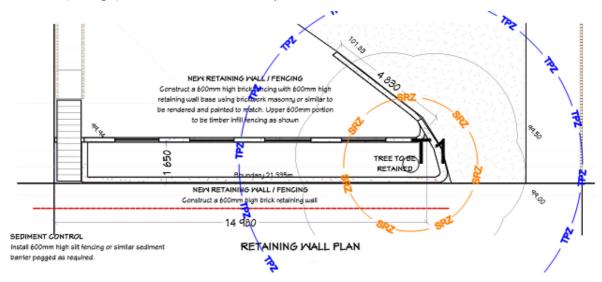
RETAINING WALL PLAN WITH TPZ AND SRZ OVERLAYED.
